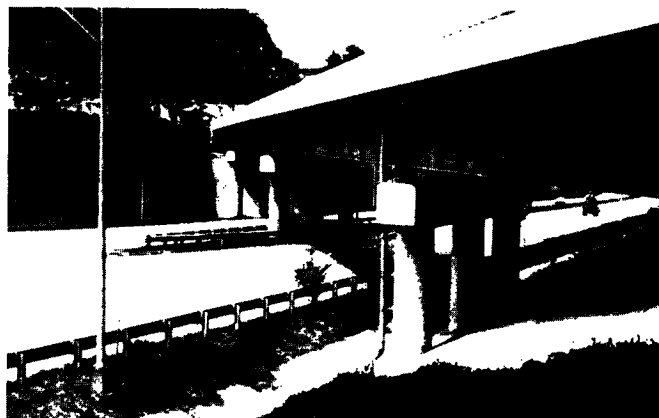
Conduit run underneath parapet to the rectifier power supply.
